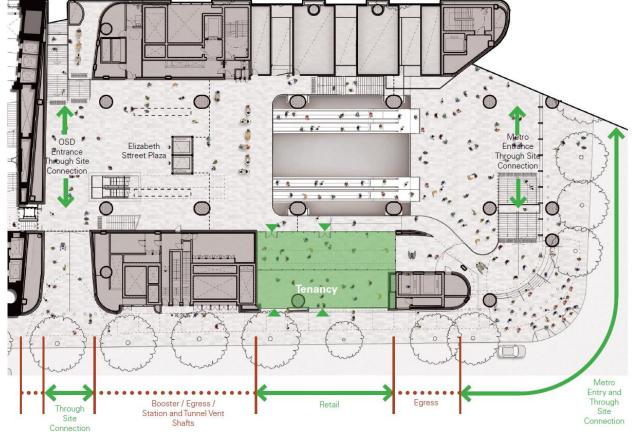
Street frontage activation Ground Floor (Elizabeth Street)
